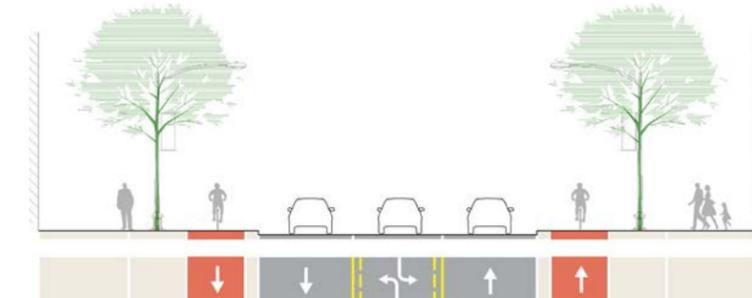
11th Street typical section Colorado Street to Guadalupe street & I35 to San Jacinto Boulevard
